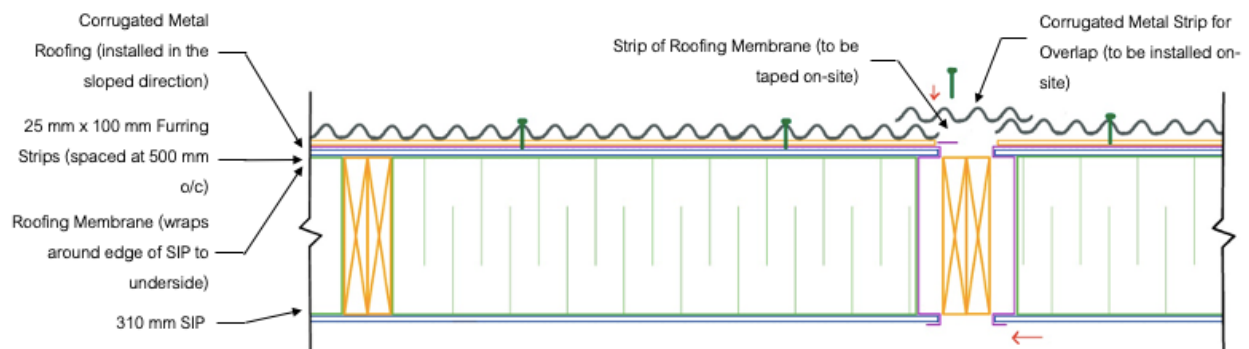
Roof Panel Cross Section & Joint Detail
